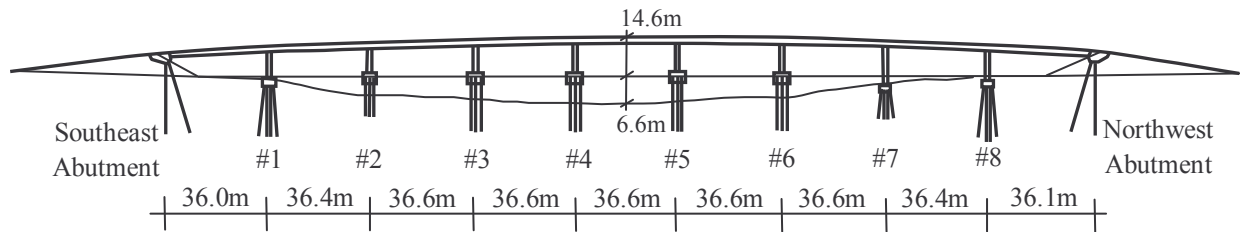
Piers and pile groups in elevational view of bridge (Elgamal et al., 2010)
